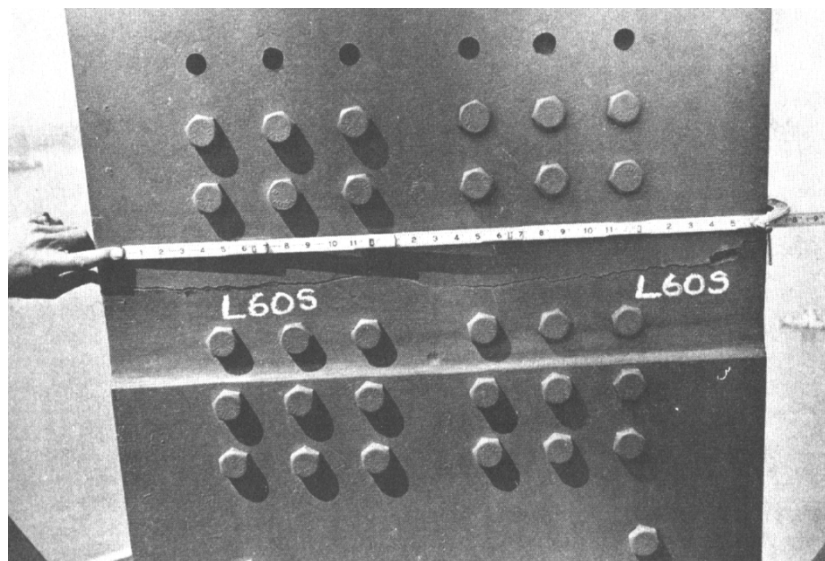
Cracked H-shaped tensile member in the Commodore Barry Bridge (Maher and Wittig, 1980)
